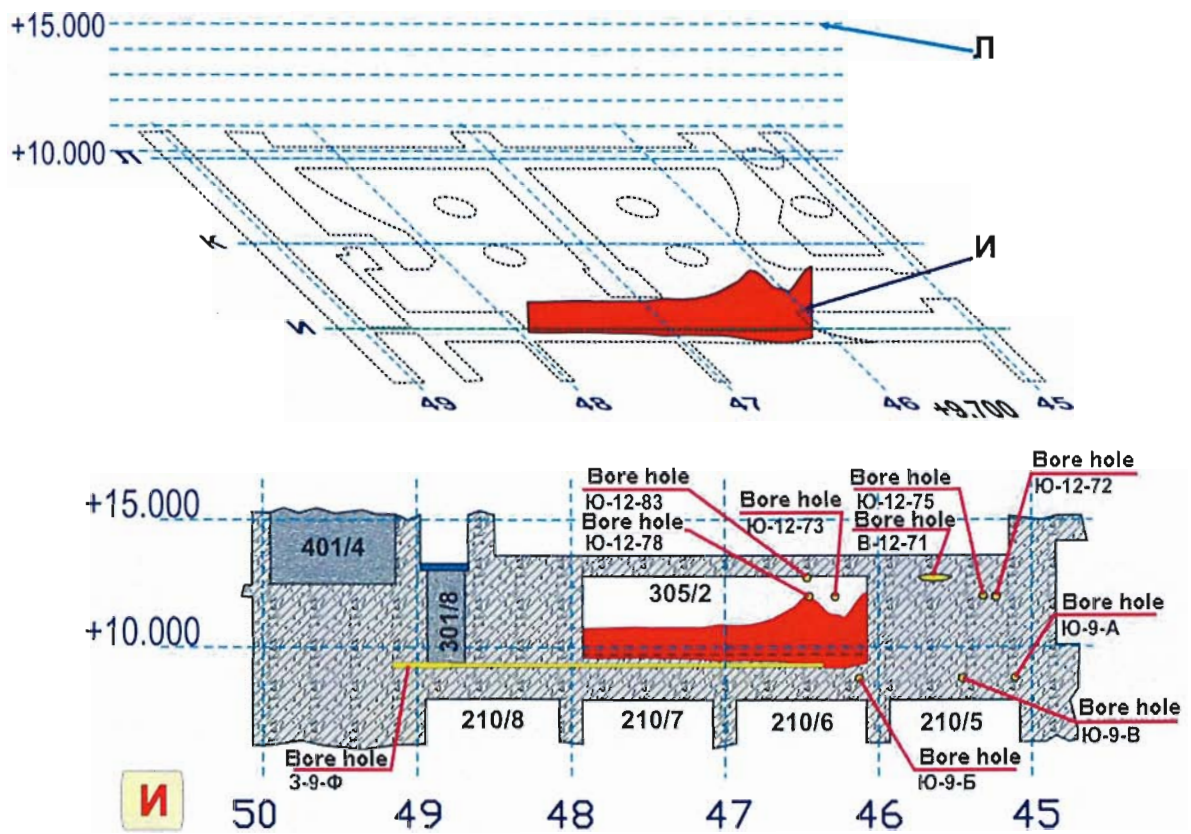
Room #305/2. LFCM. Section through row 'И'
